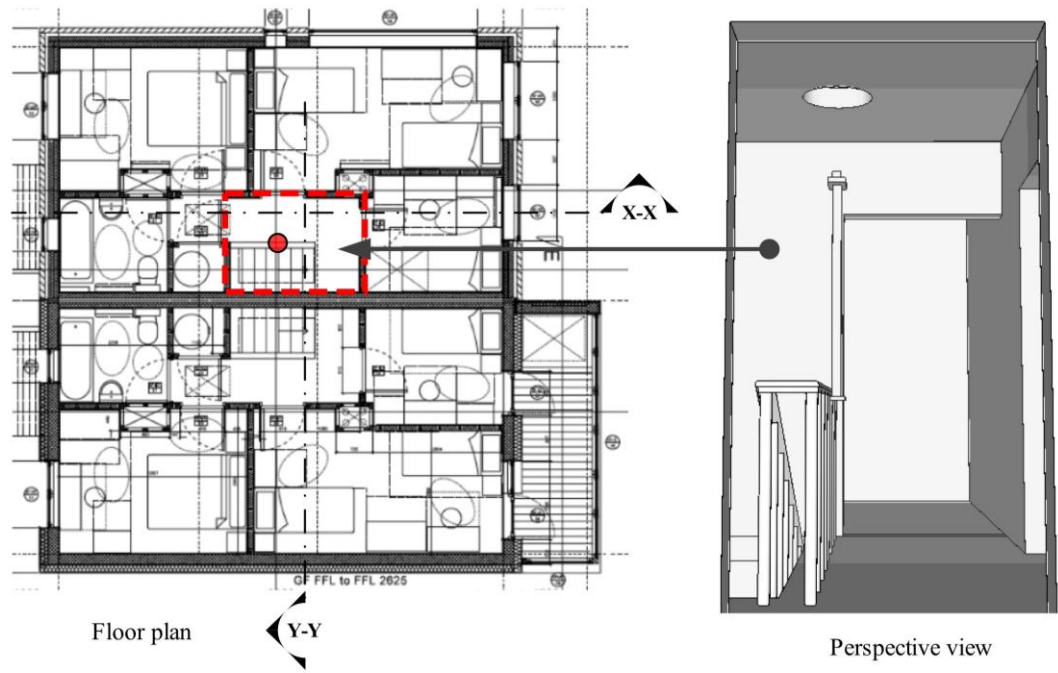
Tarmac House Second Floor Plan, Perspective View of Corridor where Lightpipe is Positioned and Section of the Corridor
